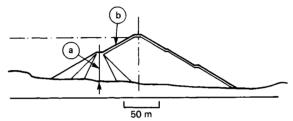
Sulby dam: cross-section. a, Central core of bituminous concrete; b, membrane of bituminous concrete
